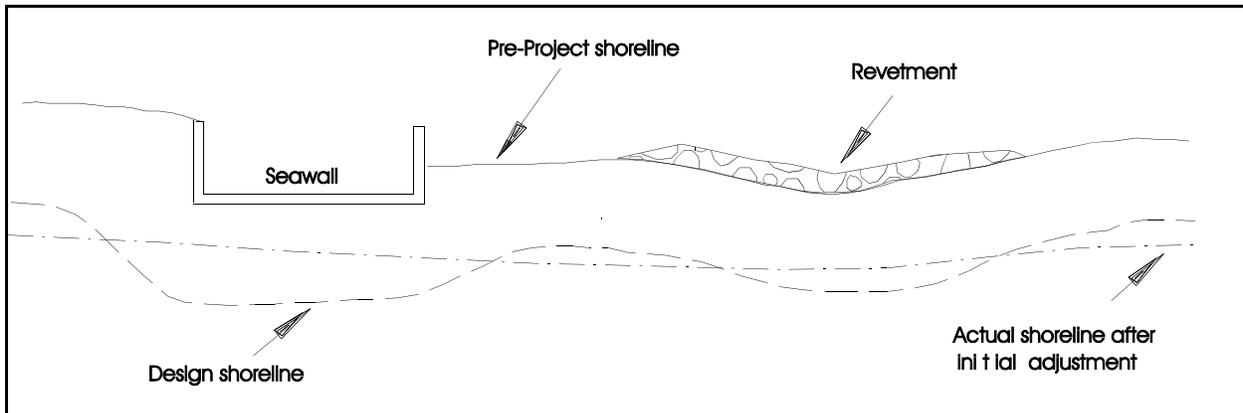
Planform adjustment of a beach-fill project designed to “wrap around” existing coastal structures
